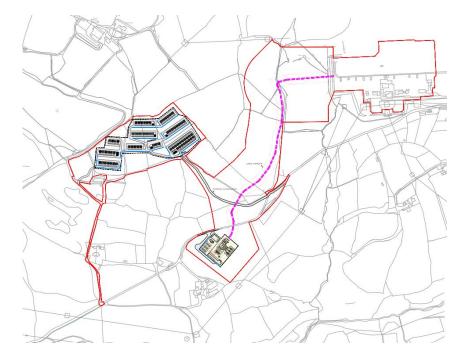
Proposed site plan detailing the location of the battery storage site with associated cabling.
